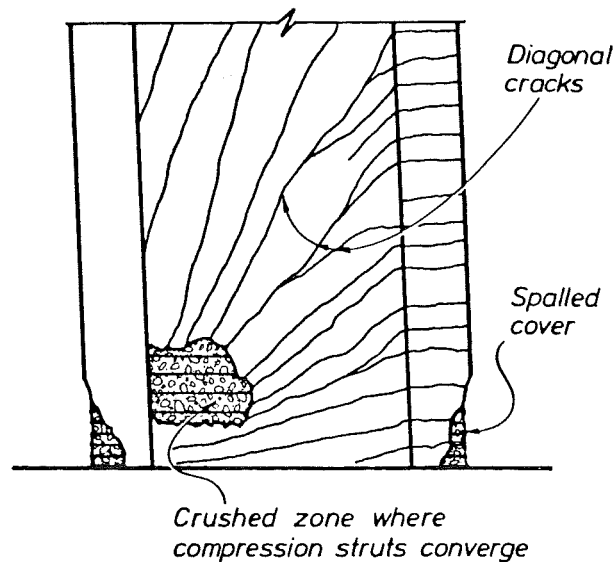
Compression Strut Crushing Failure Mechanism.
